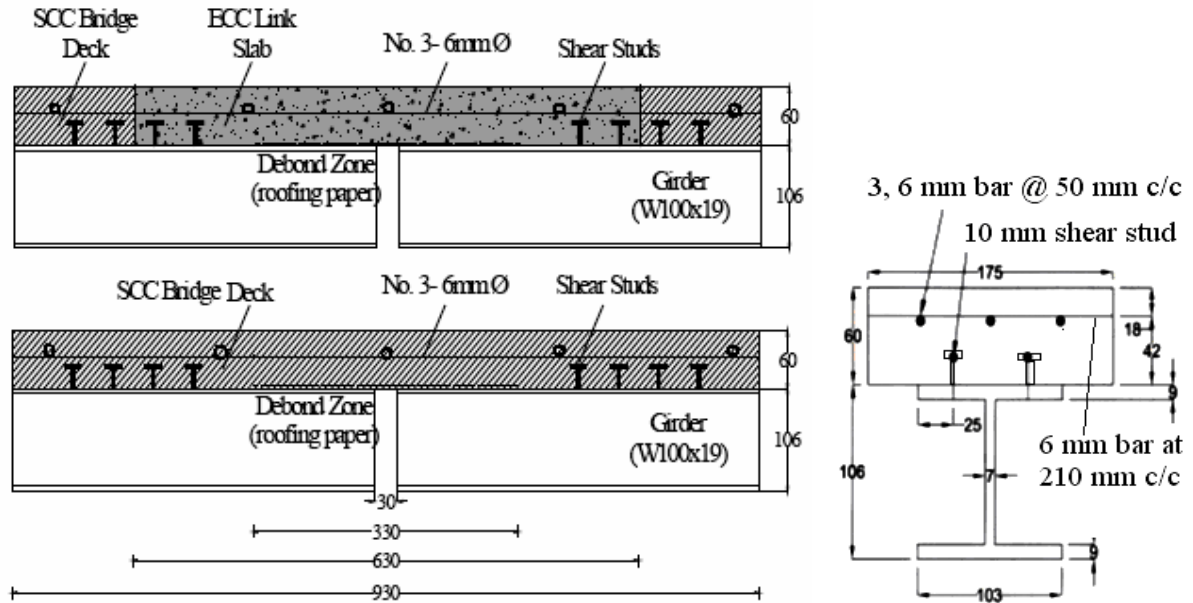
Geometry and reinforcement details of link slab specimens (Dimensions in mm)
